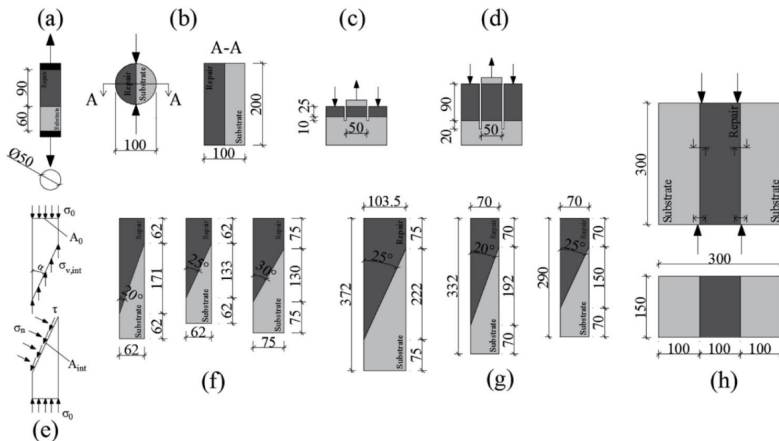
Bond test performed used in Zanotti and Randl [2019] (all dimensions in mm).
